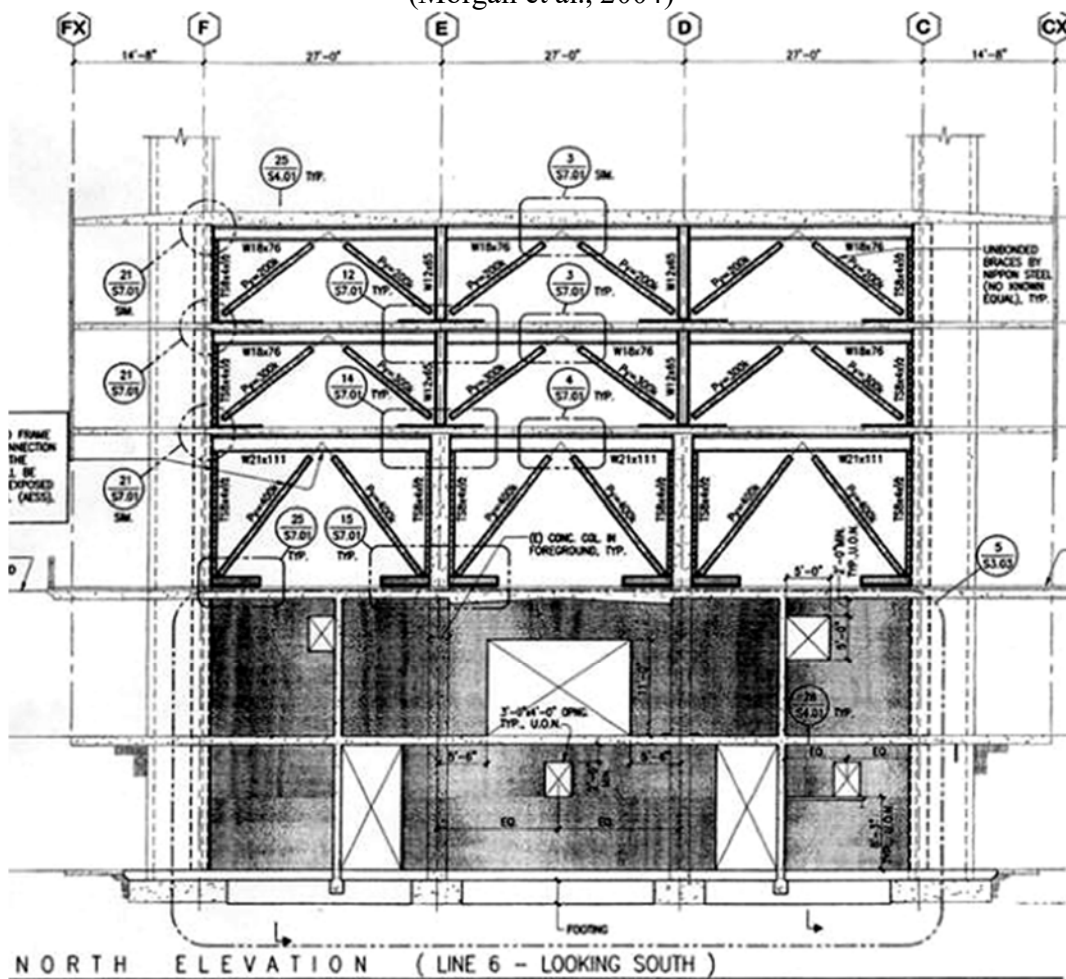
North Elevation Retrofit Plan with BRBs (Anagnos T., 2011)
